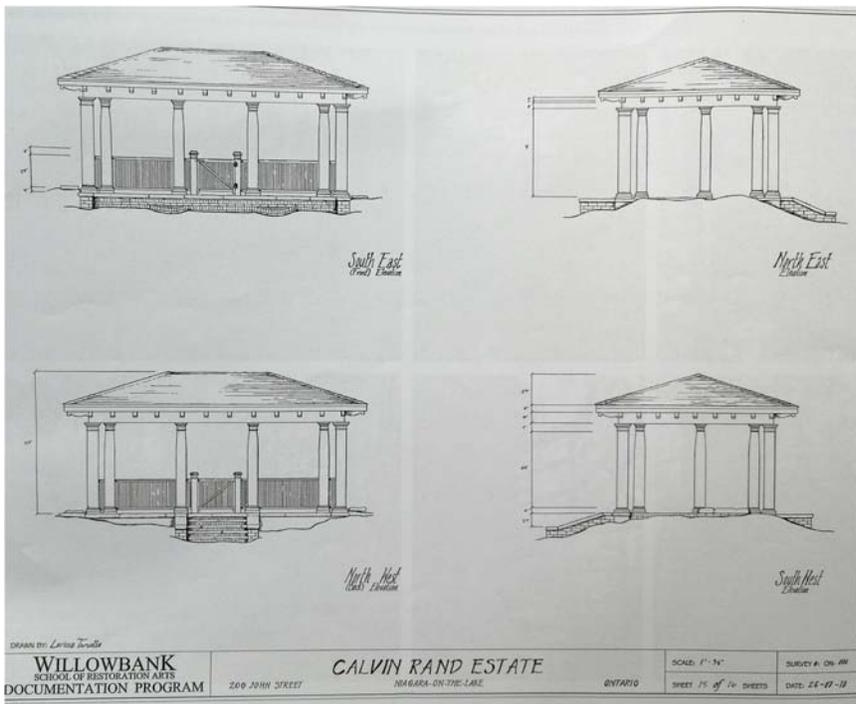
Drawings of elevations of Tea House (Willowbank, 2010).
